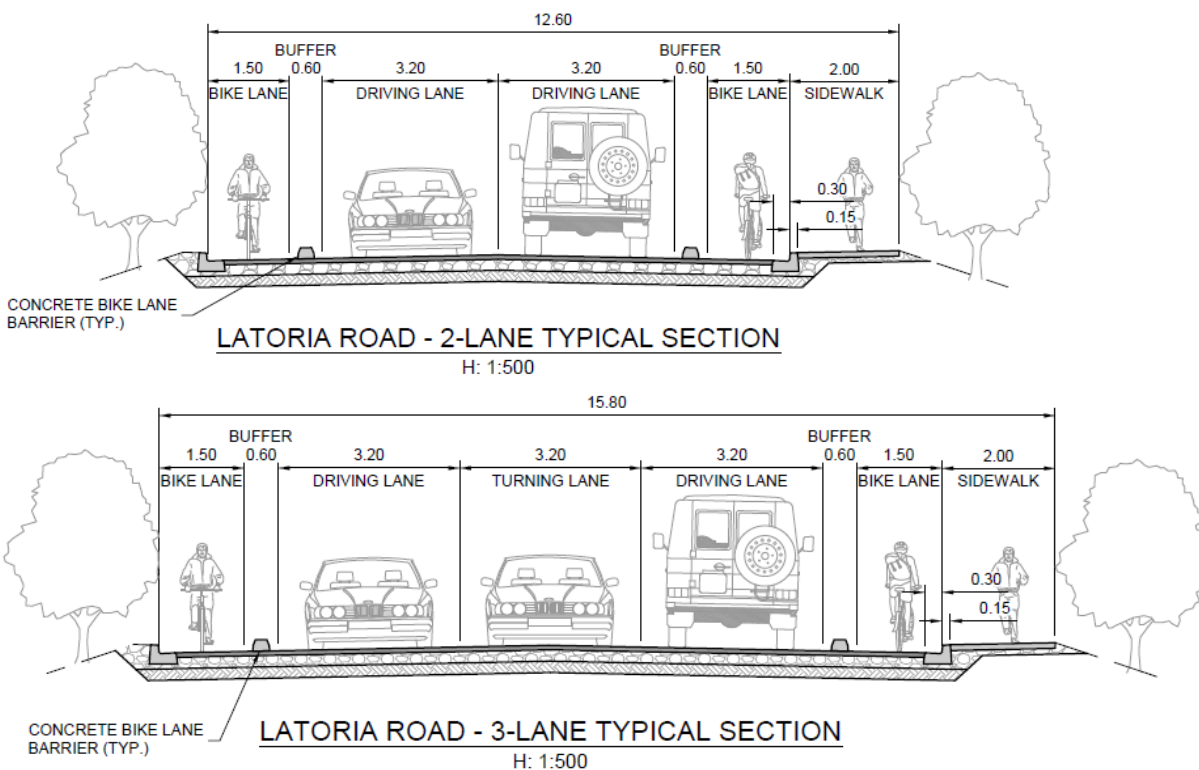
Latoria Road Proposed Ultimate Road Cross-Sections (N.T.S.)
